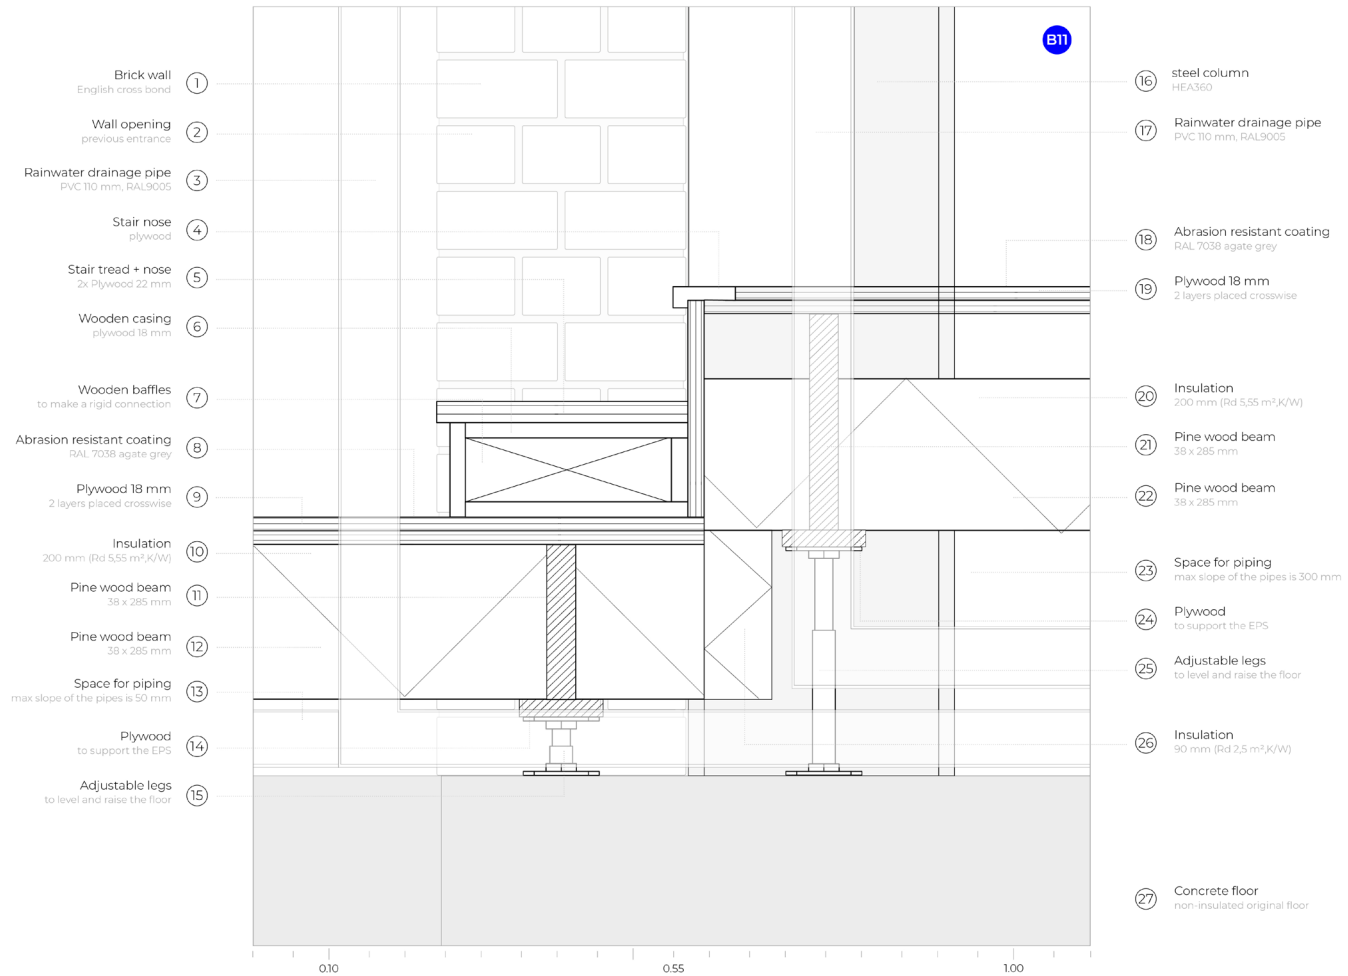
# DETAIL DRAWINGS | VERTICAL SECTION B | SCALE 1:10
